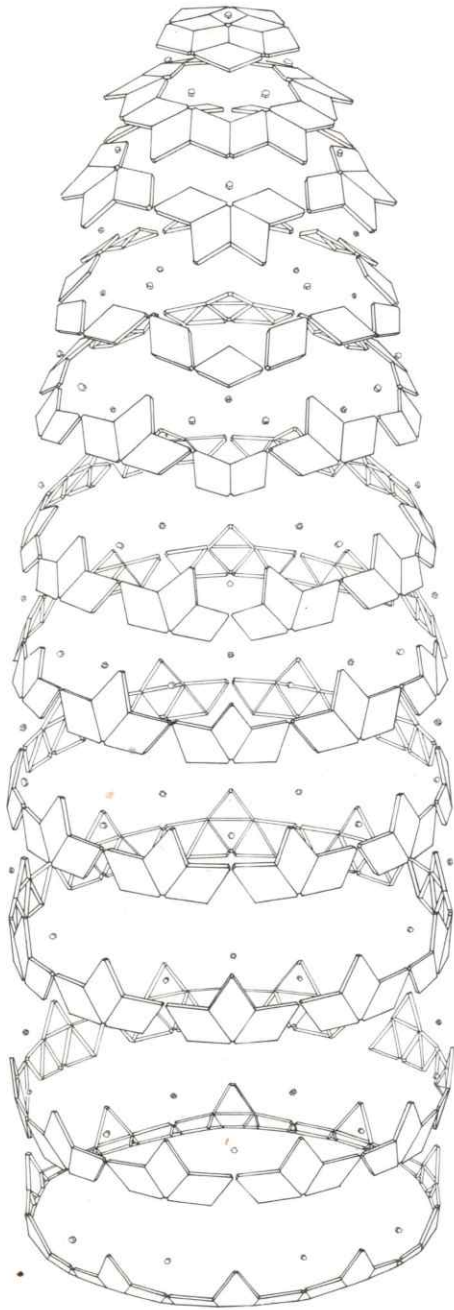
Exploded assembly view of 55' diameter 2/3 sphere polyester fiberglass panel radome. A Geometrics, Incorporated project.
